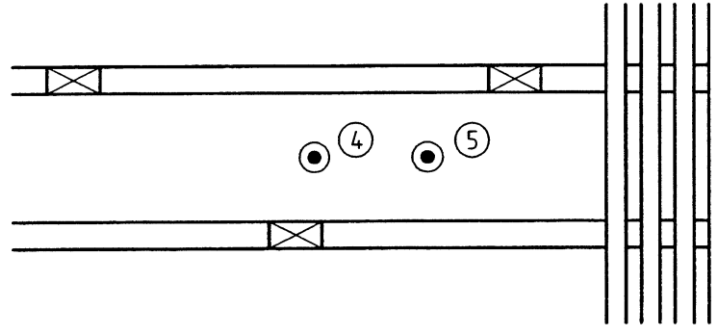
Surface-elastic floors with elastic construction (with one sprung beams layer and staggered supports)
